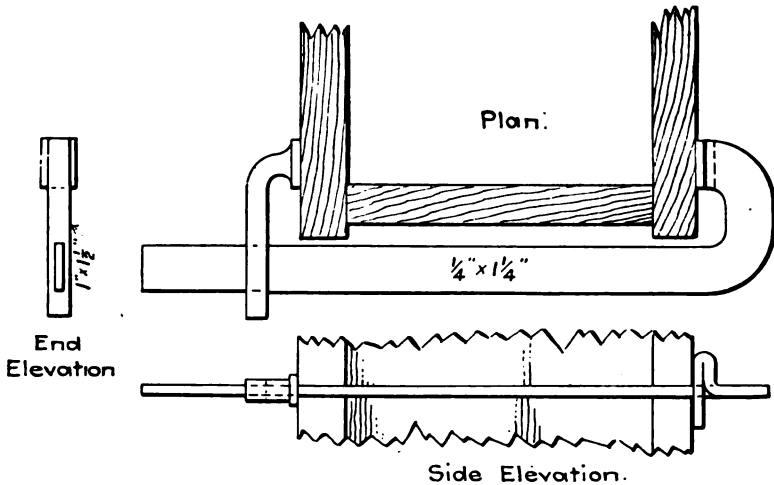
Hennebique Clamp for Floor Girder Floors.
